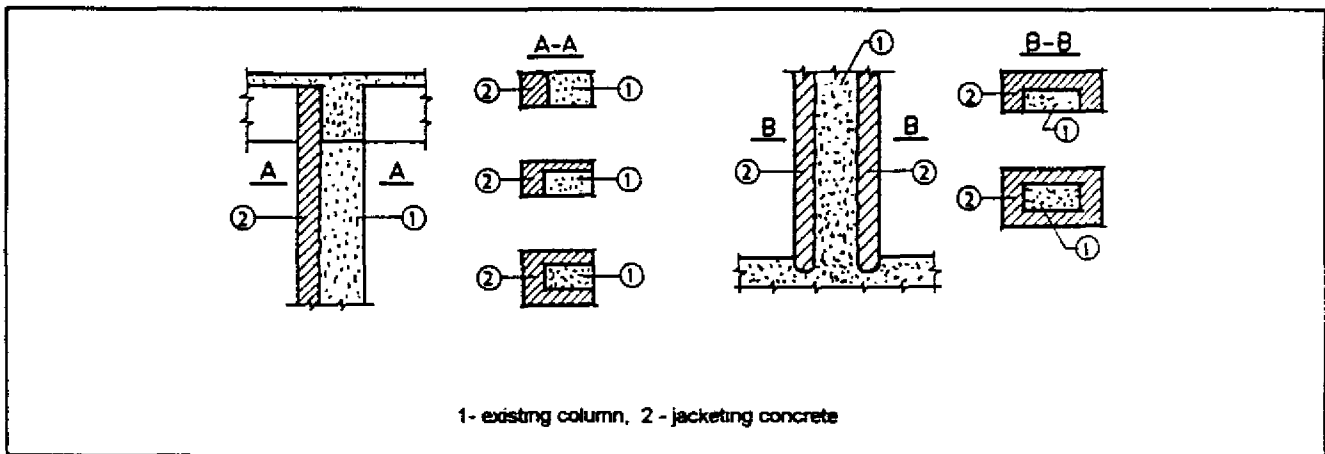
Reinforced Concrete Jacketing [3]
